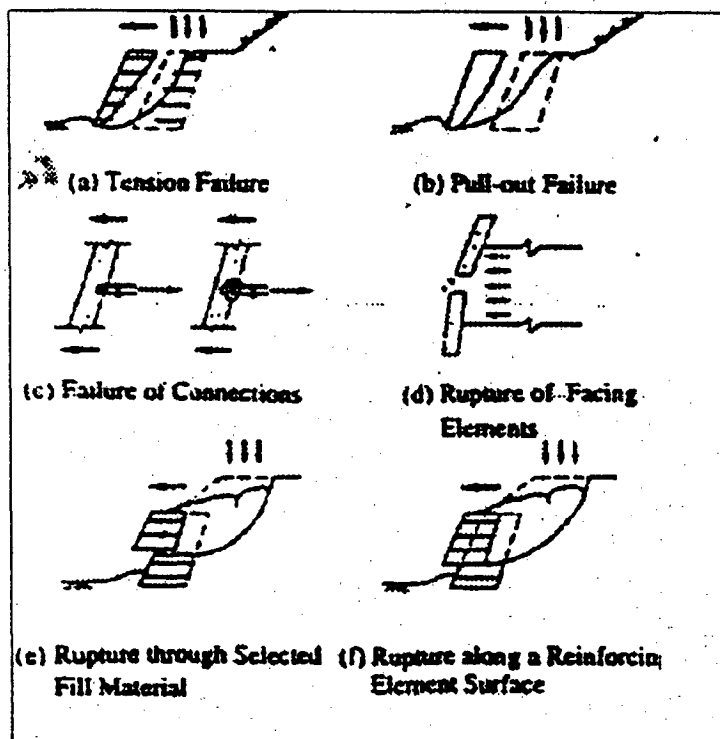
Modes of Failure in Nailed Soil (internal failure)
